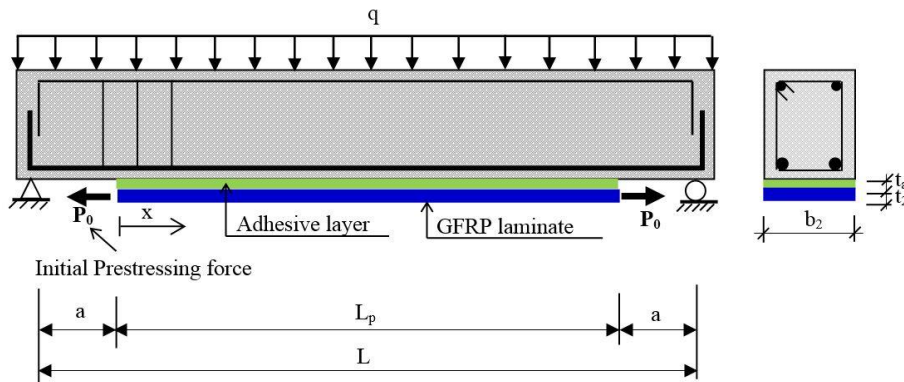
Reinforced concrete beam strengthened by a prestressed bonded GFRP laminate
